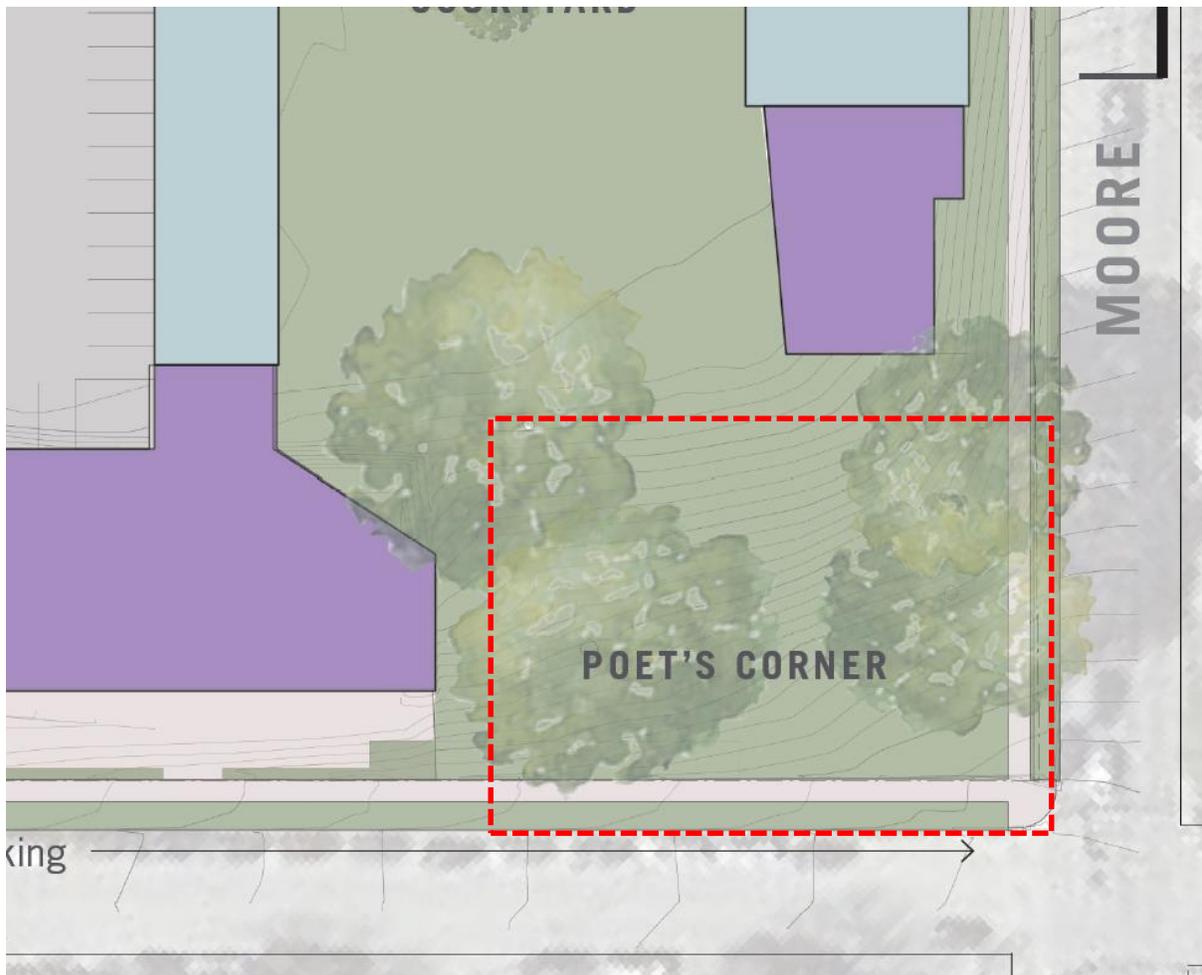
Approximate area of the Project Site to be known as Poet's Corner is depicted in red.
